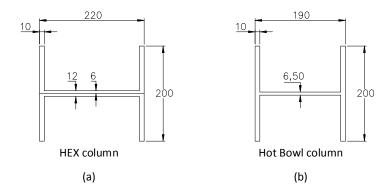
Cross-sectional area of elevator column, HEX and Hot Bowl
